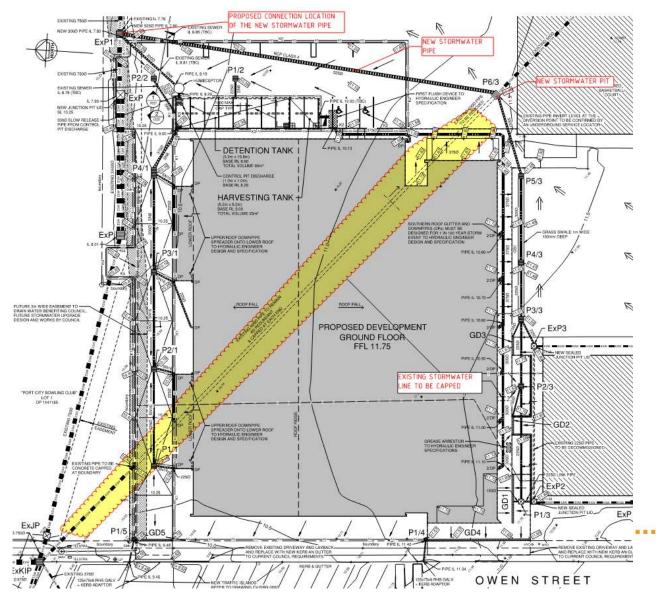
Stormwater Pipe Diversion - Current Design by MPC
